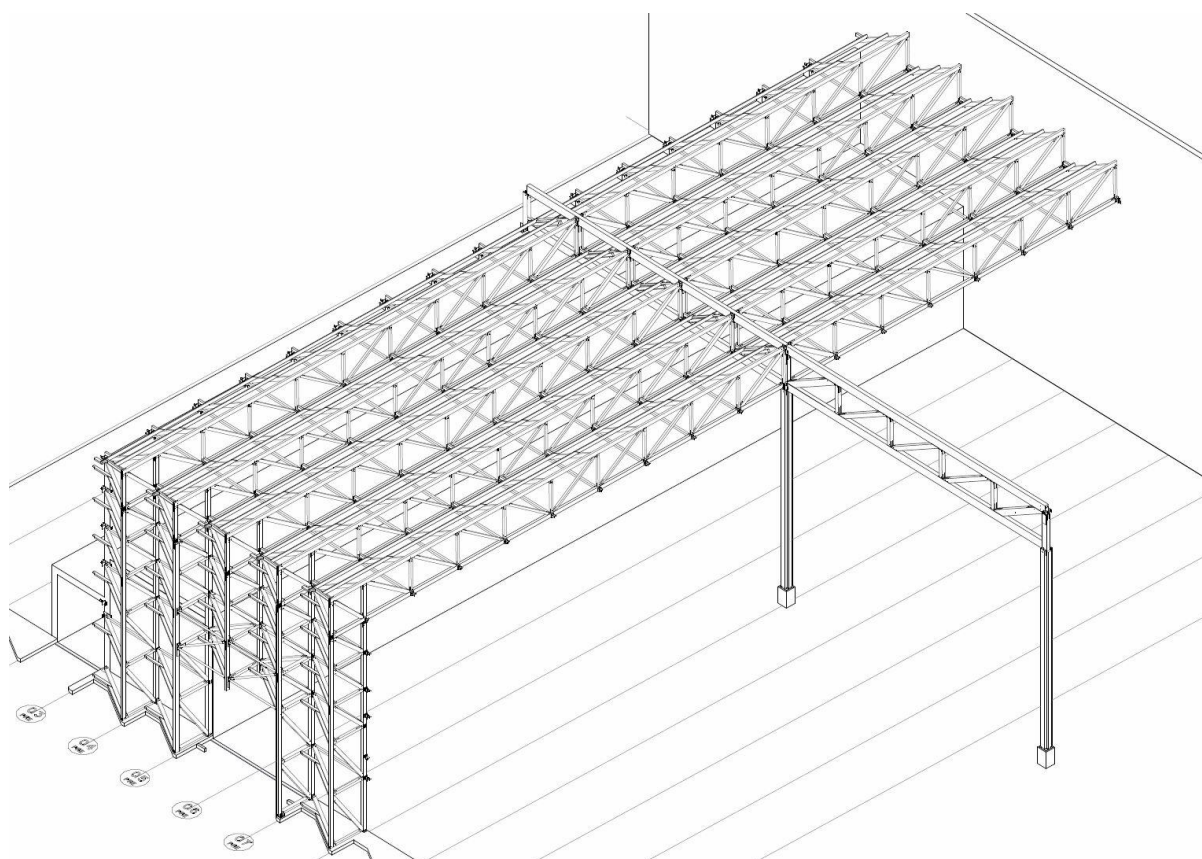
Axonometry – Intermediate posts, Main trusses, Long-span and Façade trusses
